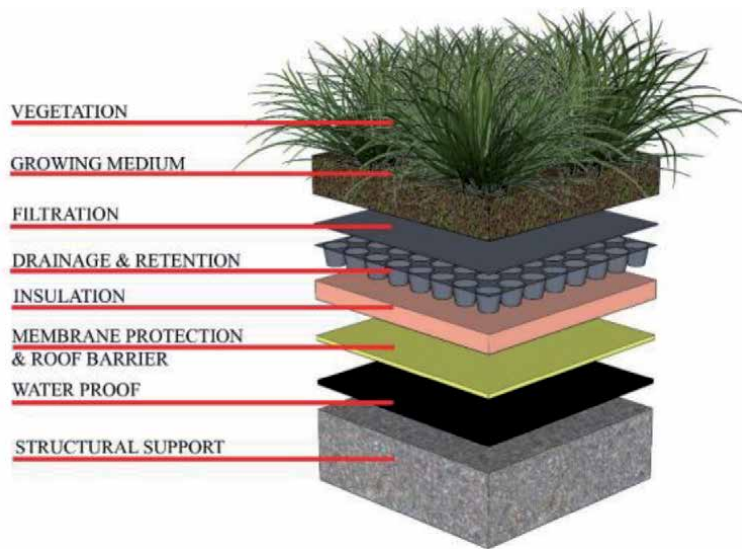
Schematic cross section of a green roof. Source: Redrawn by Co-author, reference from American Wick Drain: <https://www.awd-usa.com/drainage-applications/green-roof>.
